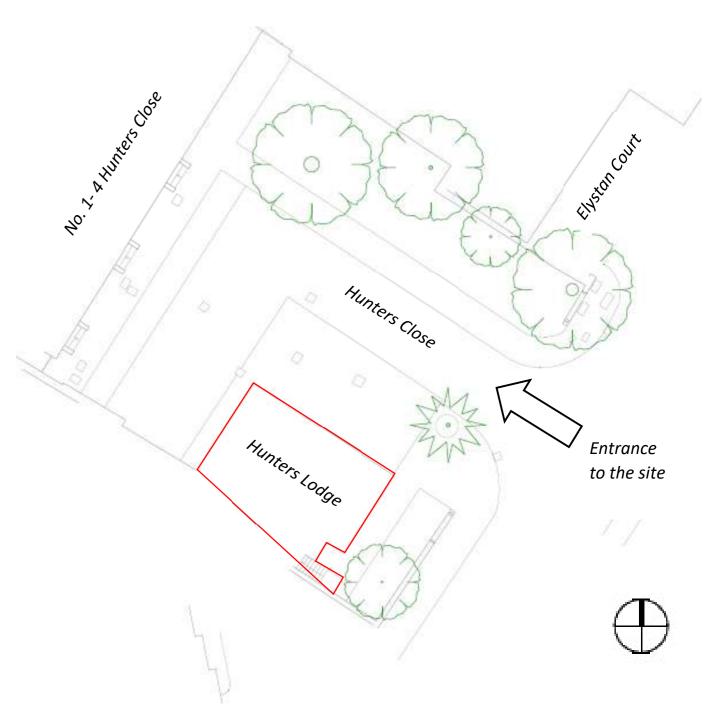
LEFT - THE SITE IS SITUATED ON THE NORTHEAST SIDE OF FRIARS LANE WHICH PROVIDES THE MAIN ACCESS TO THE SITE. FIG 4 ABOVE - THE SITE CONSISTS OF HUNTERS LODGE (THE PROPOSED DEVELOPMENT) AND NO. 1-4 HUNTERS CLOSE. THE SITE PLAN OF THE EXISTING PROPERTY IS SHOWN IN RED ALONG WITH ADJACENT BUILDINGS AND STRUCTURES.
